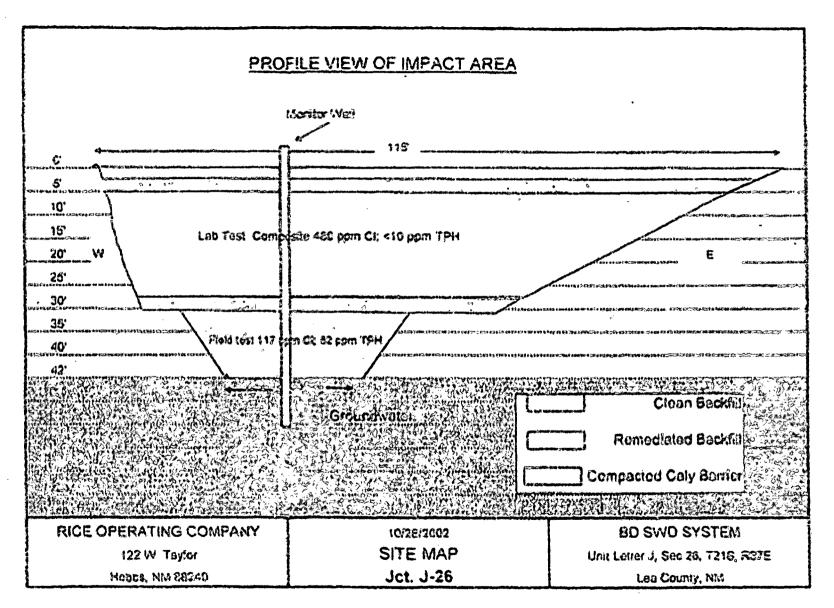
Cross sectional diagram of excavated soil and clay infiltration barriers (liners) at BD J-26 in 2002.
